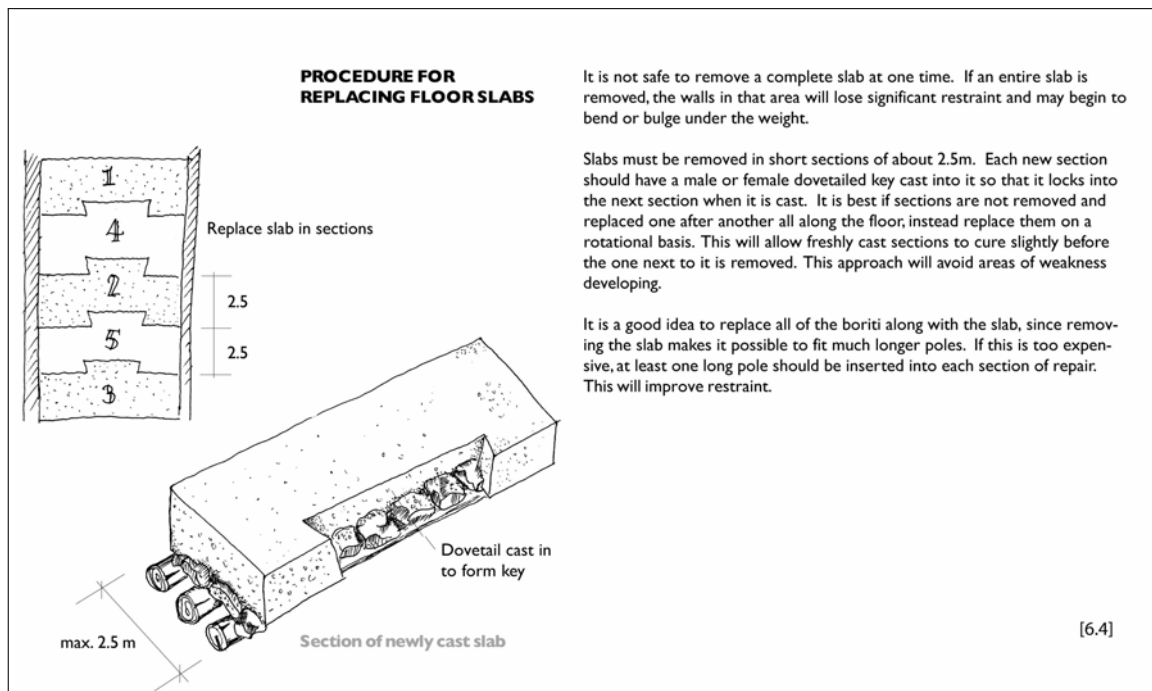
Conservation and Design Guidelines for Zanzibar Stone Town. Procedure for replacing floor slabs. Tab 6.4. [Battle and Steel, 2001.]
